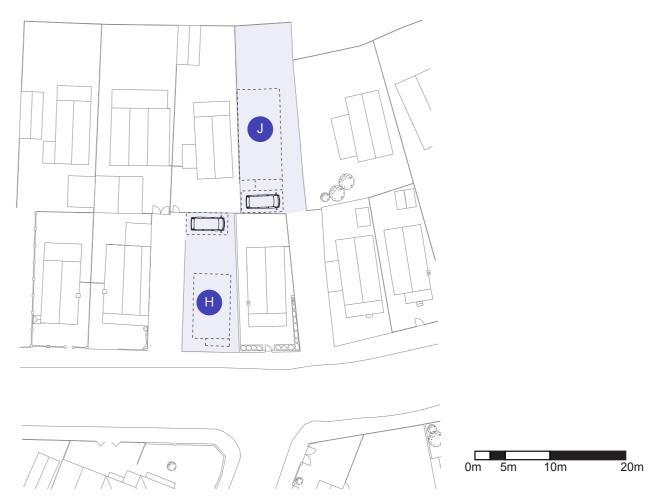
Plan showing application of guidance to typical tandem plots. Scale 1:500
